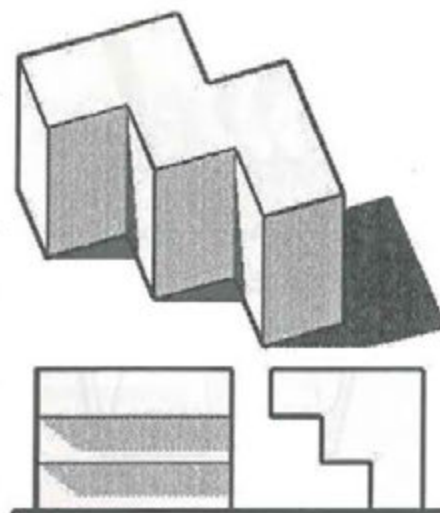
Building massing alternatives in elevation and section (cantilevered upper floors) in order to generate self shading
